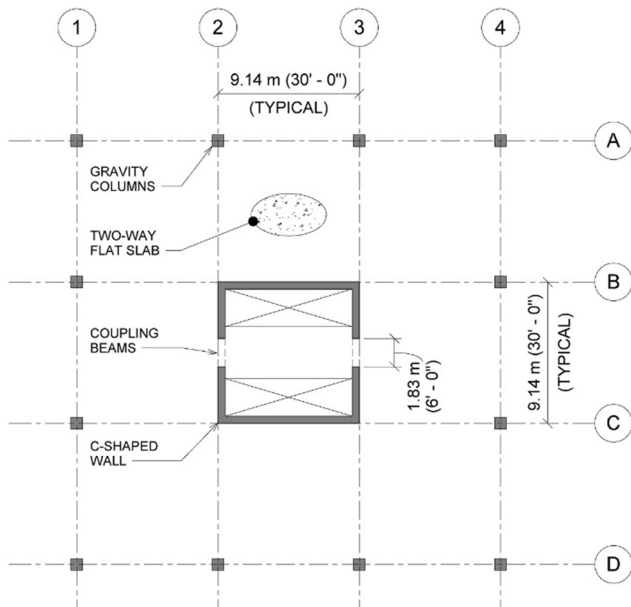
Building plan with prototype C-shaped coupled core wall system.
